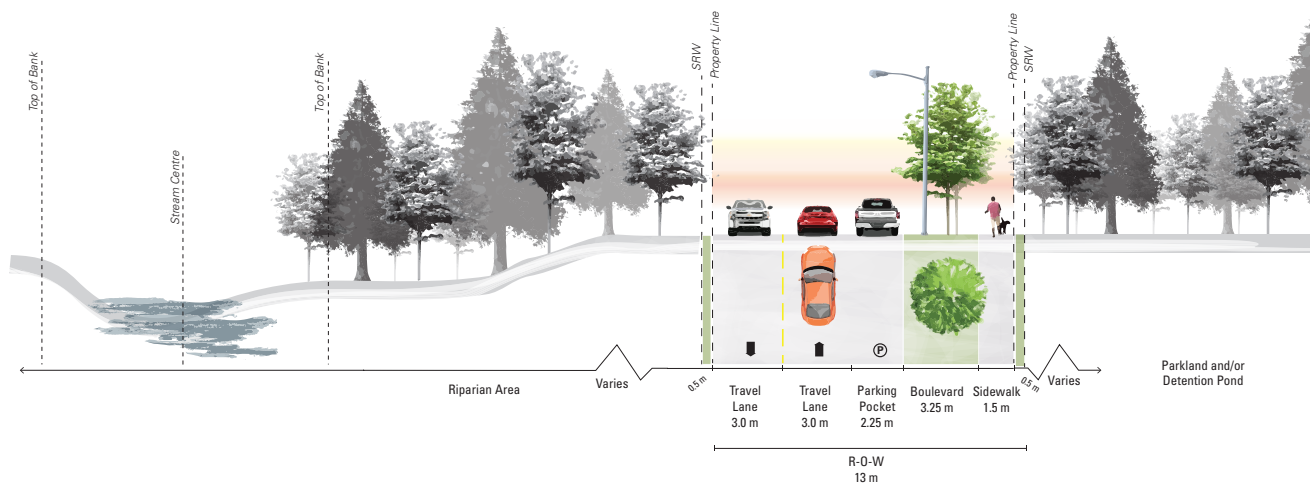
Local Road Adjacent to BCS Corridor 13 m Cross-section
